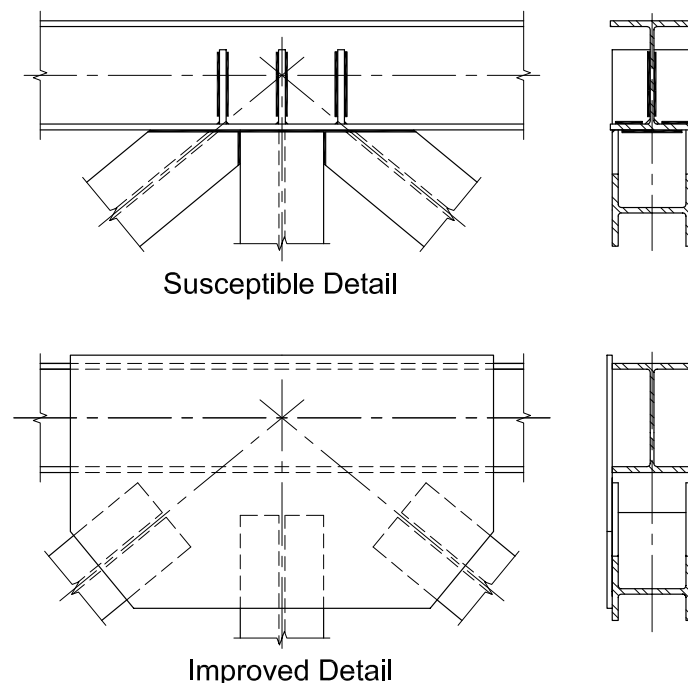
Susceptible and improved details to avoid intersecting welds with high restraint.
